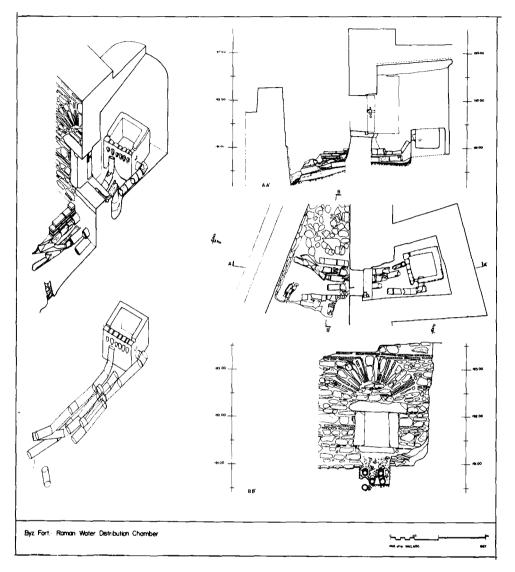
Roman water distribution chamber section, plan elevation, and isonometric views
